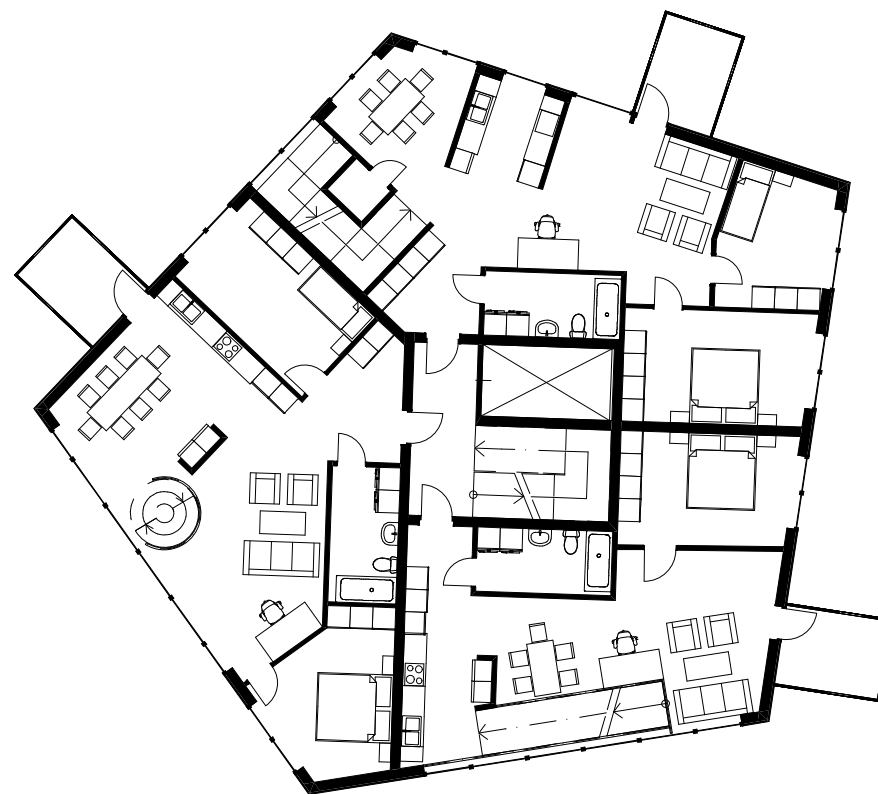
Final design proposal of the residential upper floor of the bokaler, 1:200
